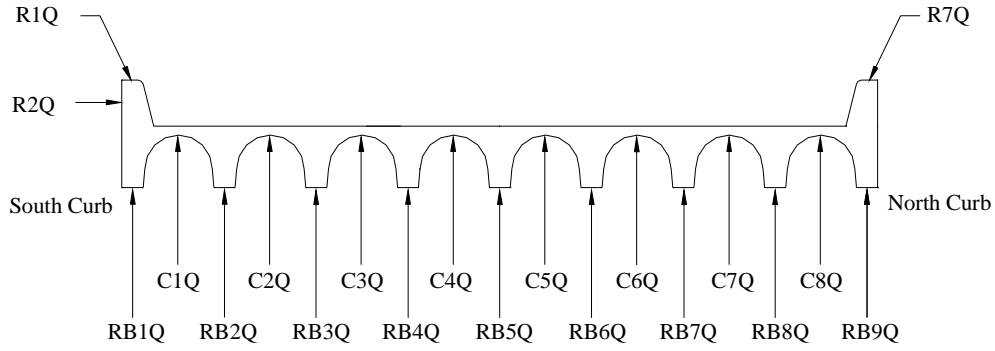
Plan View of Span Indicating Locations of Instruments
